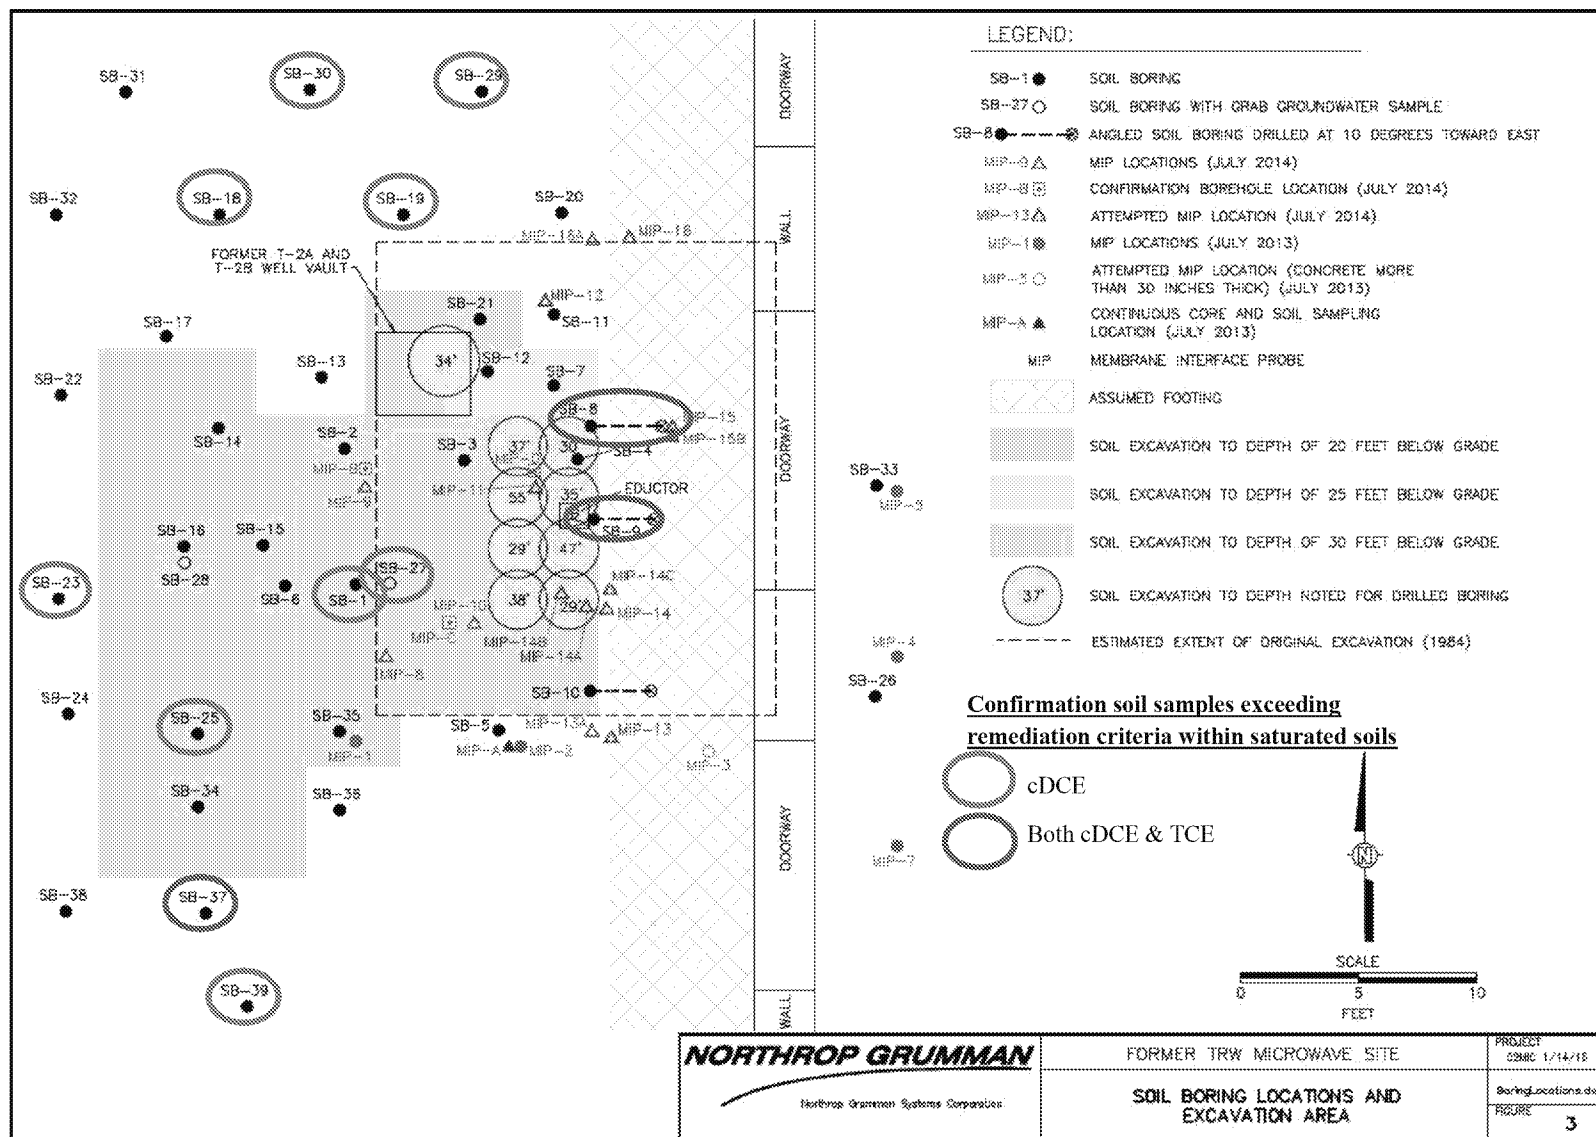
TRW 2014 Soil Excavation and Boring Locations
